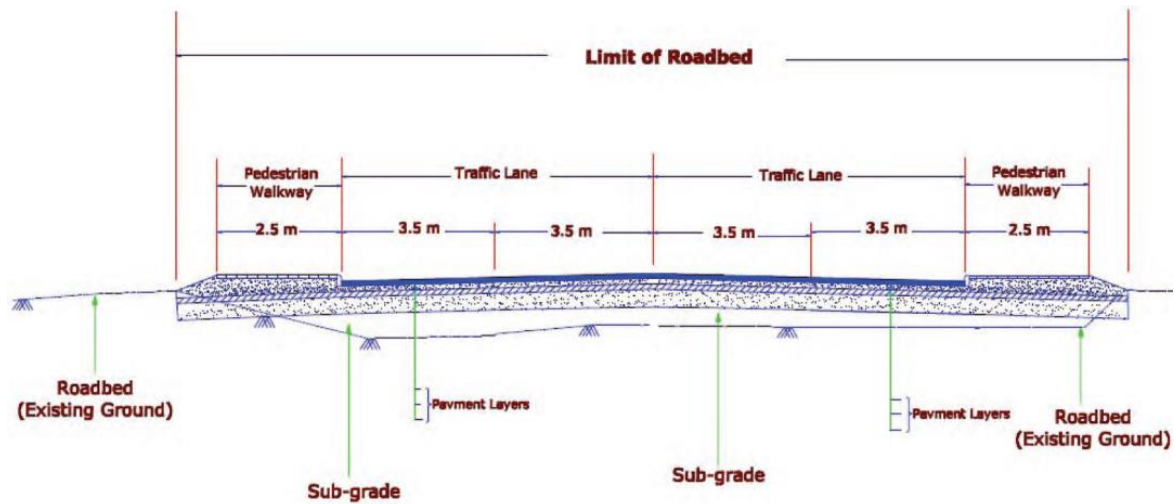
Divided Two Lane (Wereda Seat) Typical Town Section
